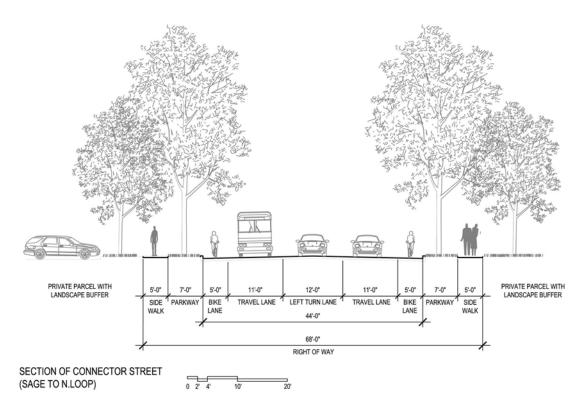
South Loop Road and Sage-Loop Connector Road Sections
